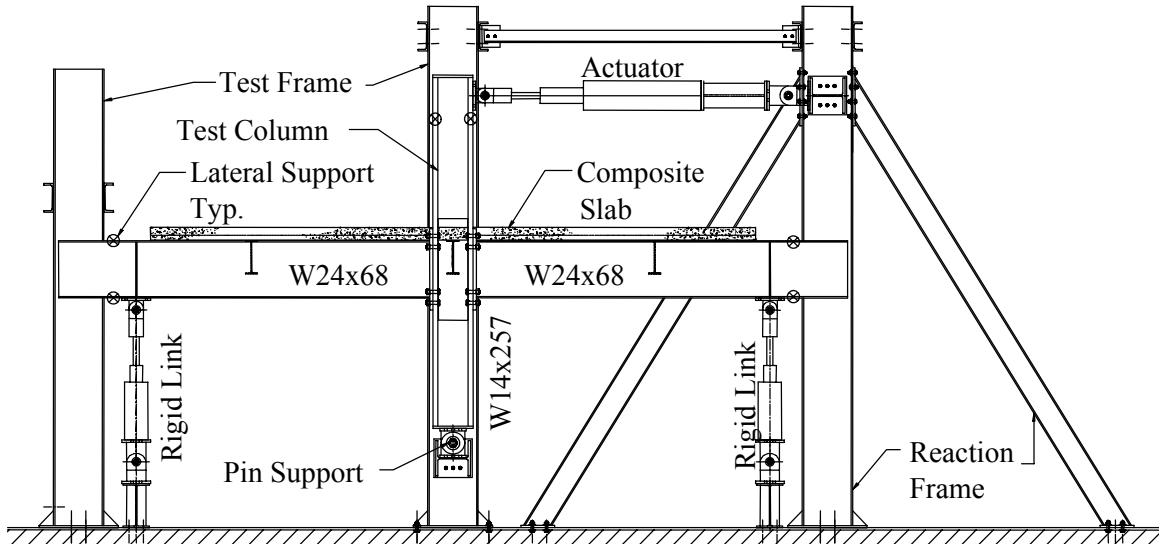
ELEVATION OF SLAB TEST SETUP
